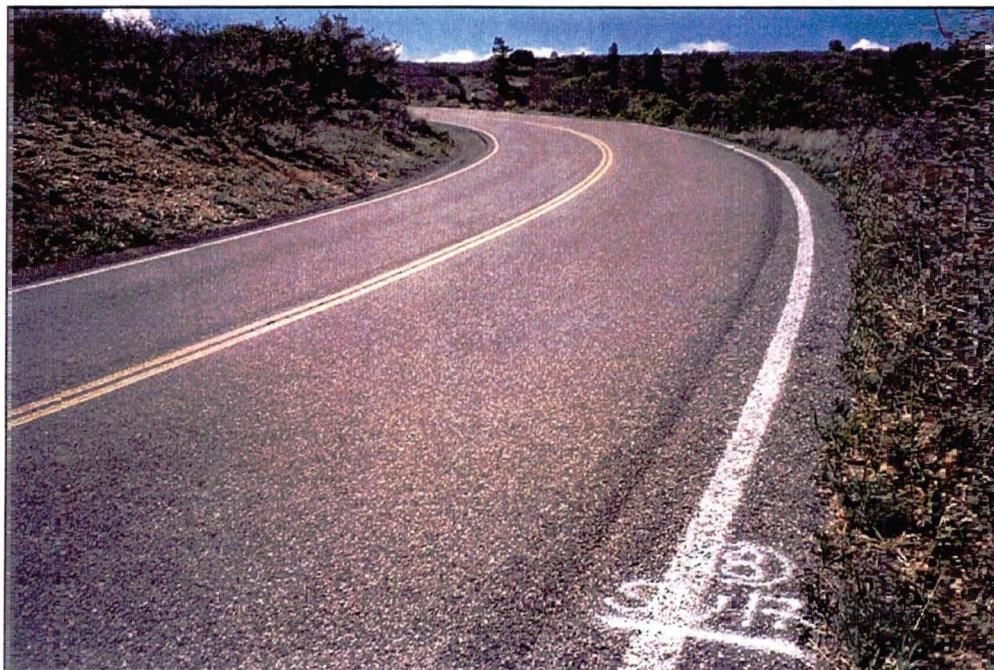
Section 8, Sample Unit 17 (MP 6.78)
